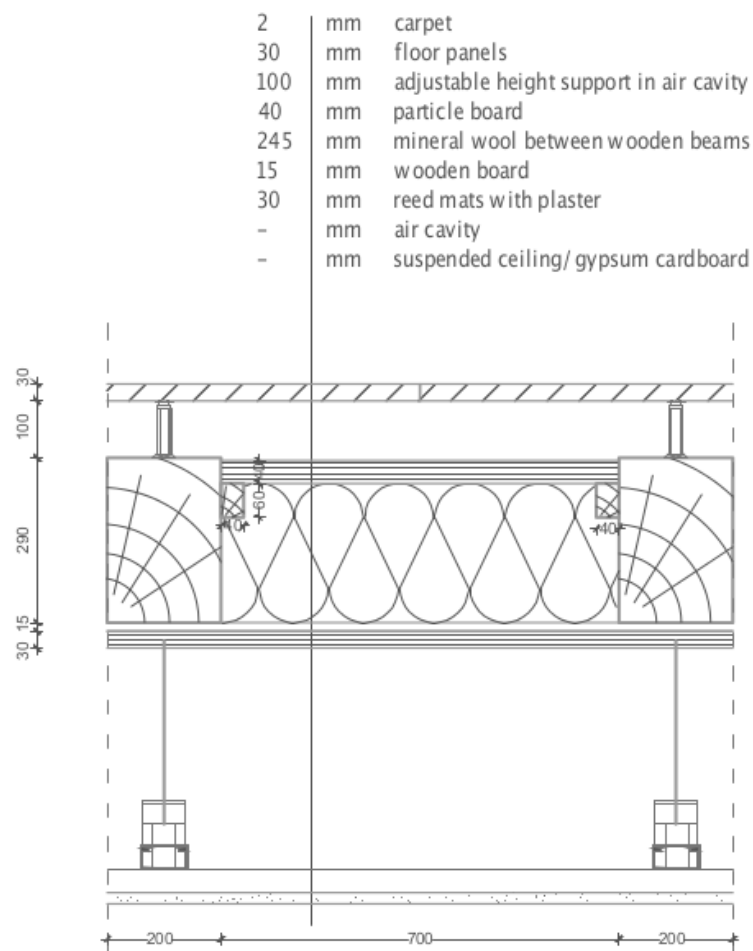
Non-refurbished construction (a); wooden beam floor separating the 3<sup>rd</sup> and 4<sup>th</sup> level
